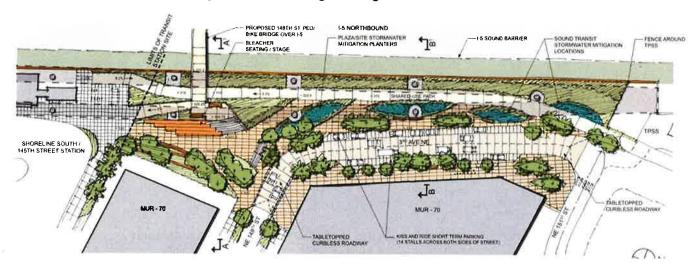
3rd Avenue Woonerf Concept Plan View
